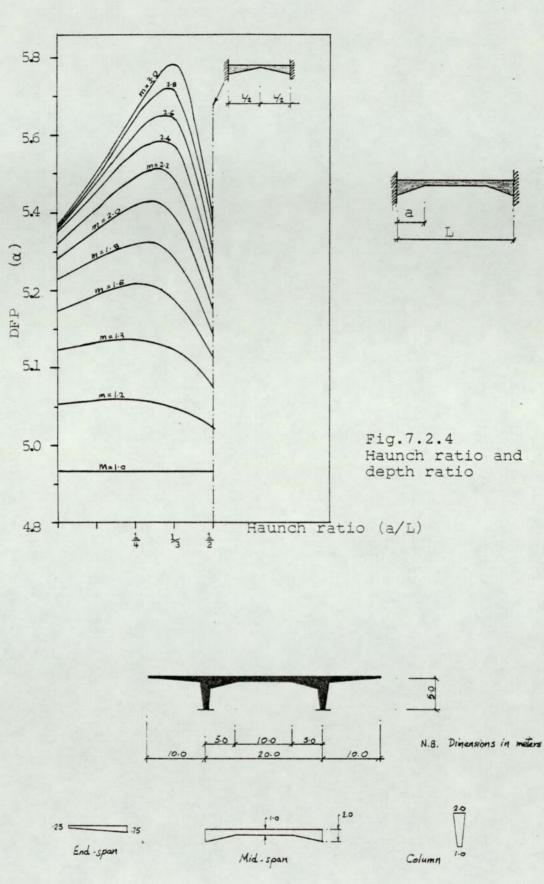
Dimensions of a bridge with all members in tapered section
